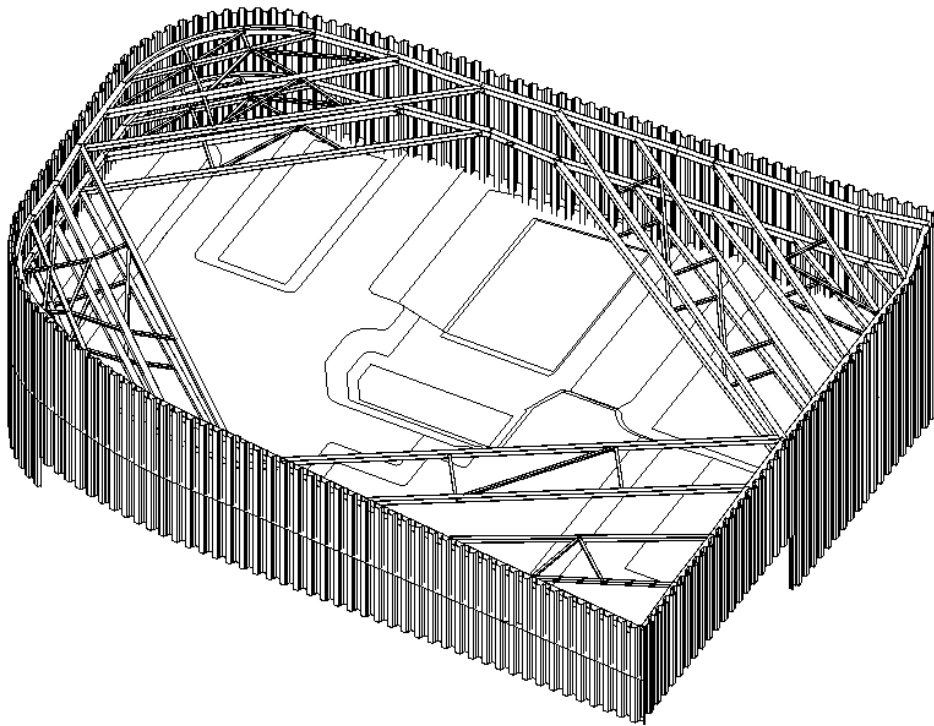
3D View of Excavation and Lateral Support (Engineer's design)
